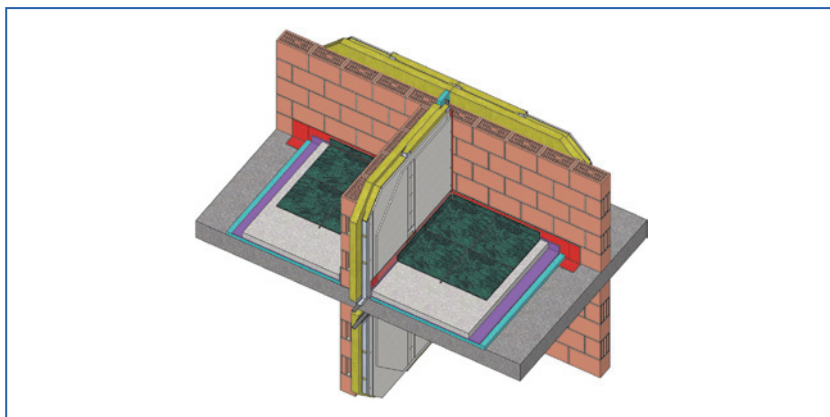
Building with continuous floor slabs and a party wall with a single load bearing wall with gypsum board linings [[2]- (Belgium)].
